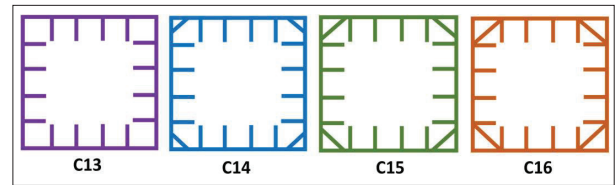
Different corner stiffener arrangements with vertical stiffeners in Set-3
